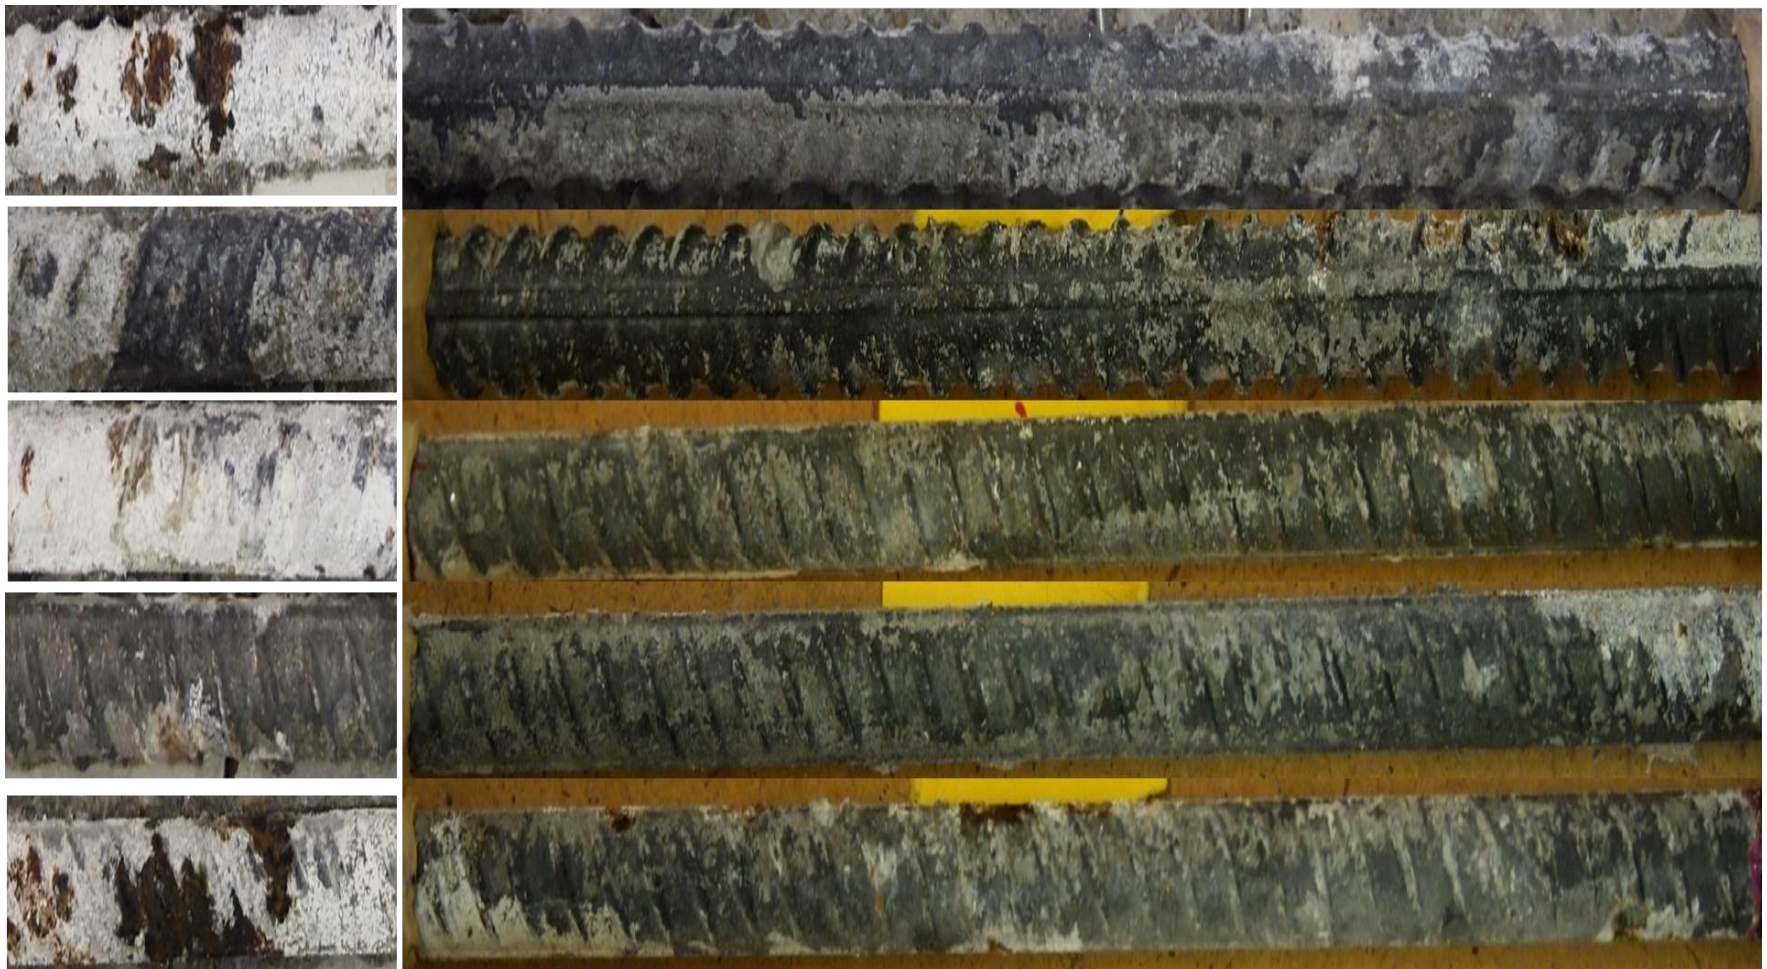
Non-exposed surface (to concrete crack) of transversely- (left) and longitudinally- (right) cracked C3 steel specimen 1 to 5.
